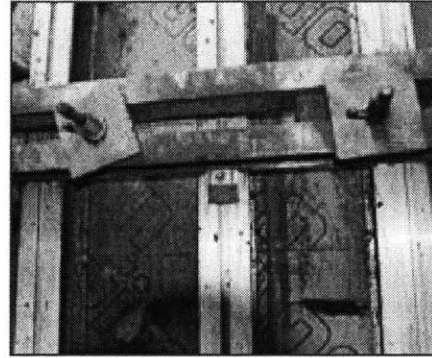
Wall form accessories: tie-nuts, tie rods connection
